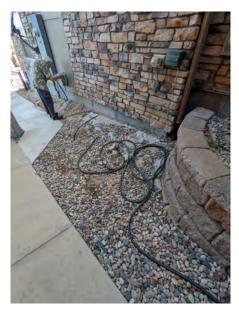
, 6 & 7 – These pictures show a more close up look of the grading on both properties and how they still slope towards the center after the sidewalk was completed. In the center photo, you can see how the neighbor's "old" sidewalk is tilted towards Norvel's property so that water would run off towards the center.
